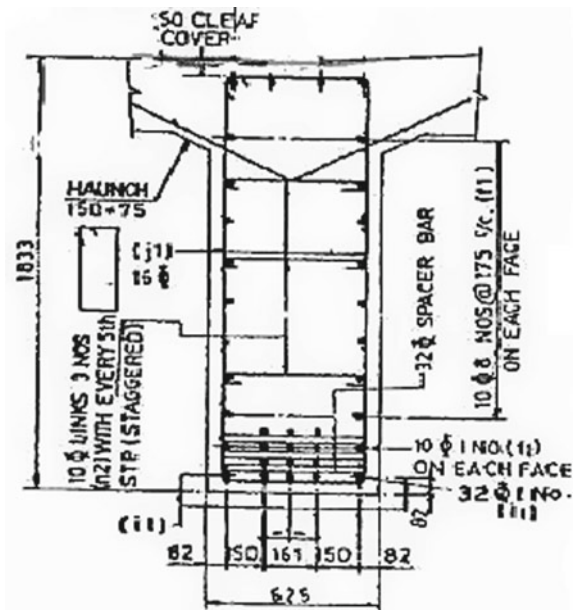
Cross-section of T-beam bridge girder for 21 m span
